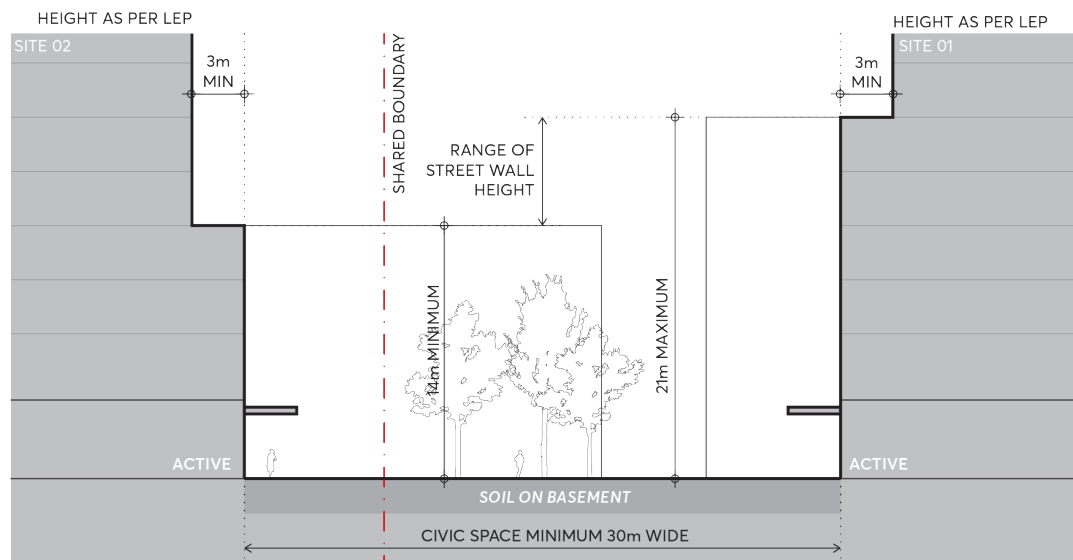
Civic Space (Section K) Setbacks and Street Wall Height
